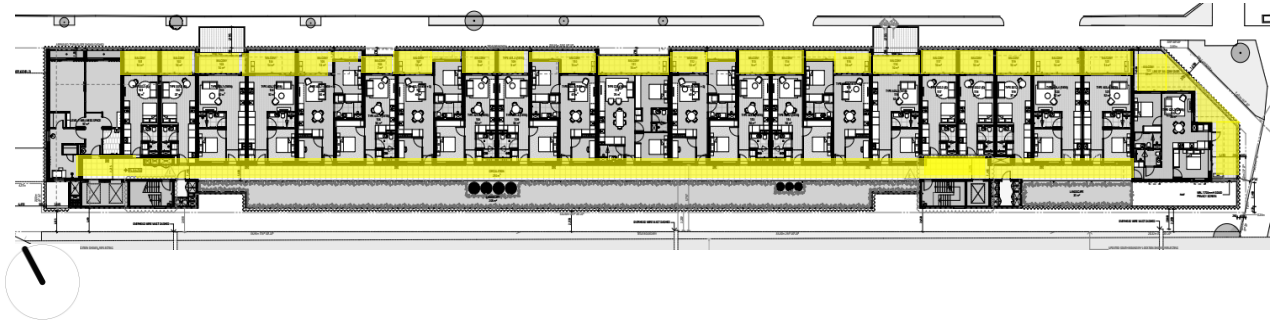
Ground floor plan with recommended wind criteria overlaid.
